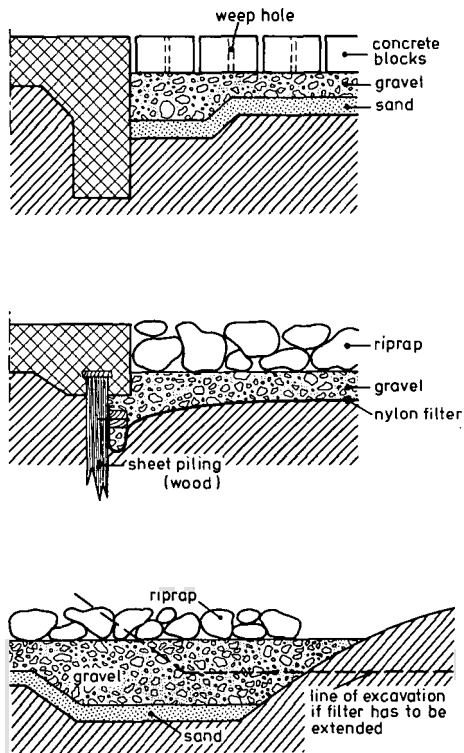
Examples of filter construction details (after van Bendegom 1969)
